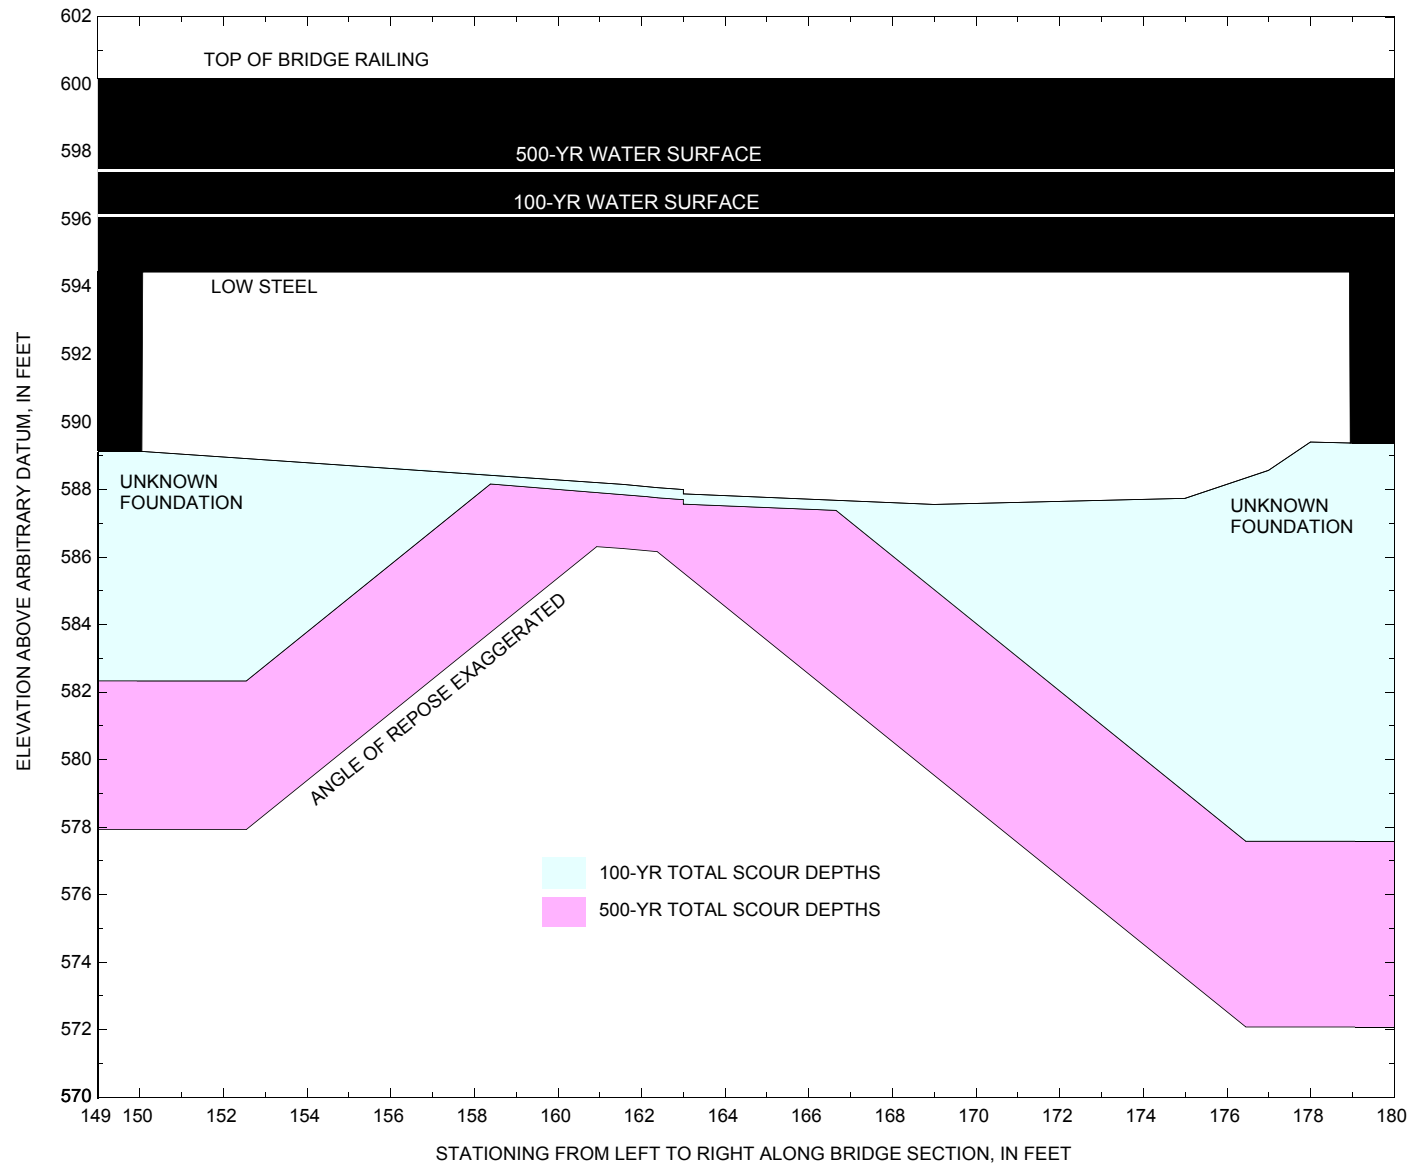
Scour elevations for the 100-yr and 500-yr discharges at structure [NORWTH00120010](#) on town highway 12, crossing [Bloody Brook, Norwich, Vermont](#).
